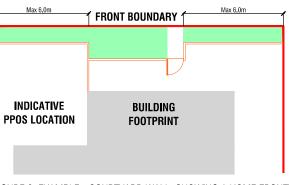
EXAMPLE - COURTYARD WALL, SHOWING A HOME FRONTING OPEN SPACE, WITH AN ARTICULATED GATE ENTRY AND PLANTING ZONE.
